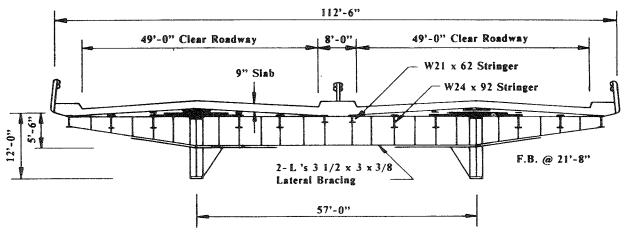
Cross section of 120-ft simple span, noncomposite two-girder bridge (Ref. 59).
